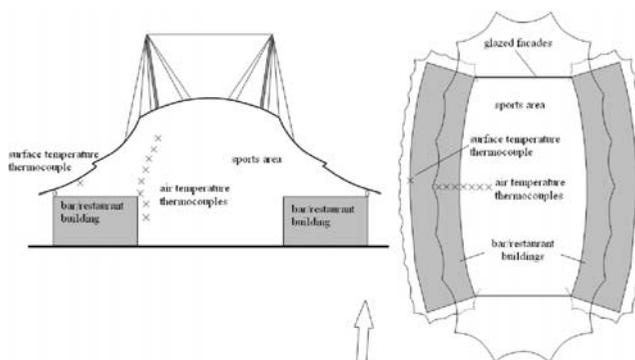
Section (left) and plan (right) showing the position of the monitoring equipment in the Inland Revenue Amenity Building.
